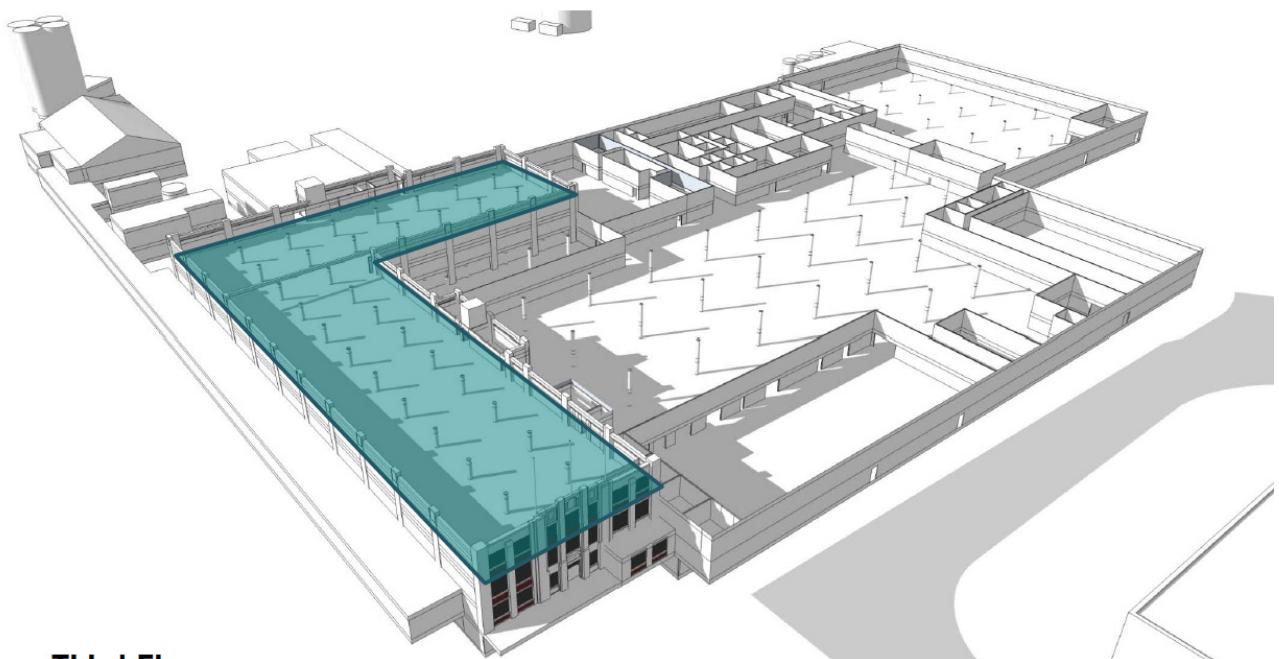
A three-dimensional diagram of the historic Pond's building and existing factory structures Source: The Cecil Group
